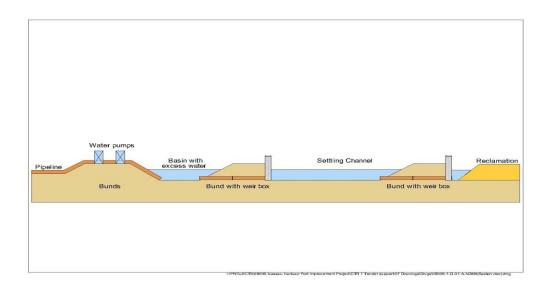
Sectional view of de-watering system - before crossing by pumps to -70 feet CD
